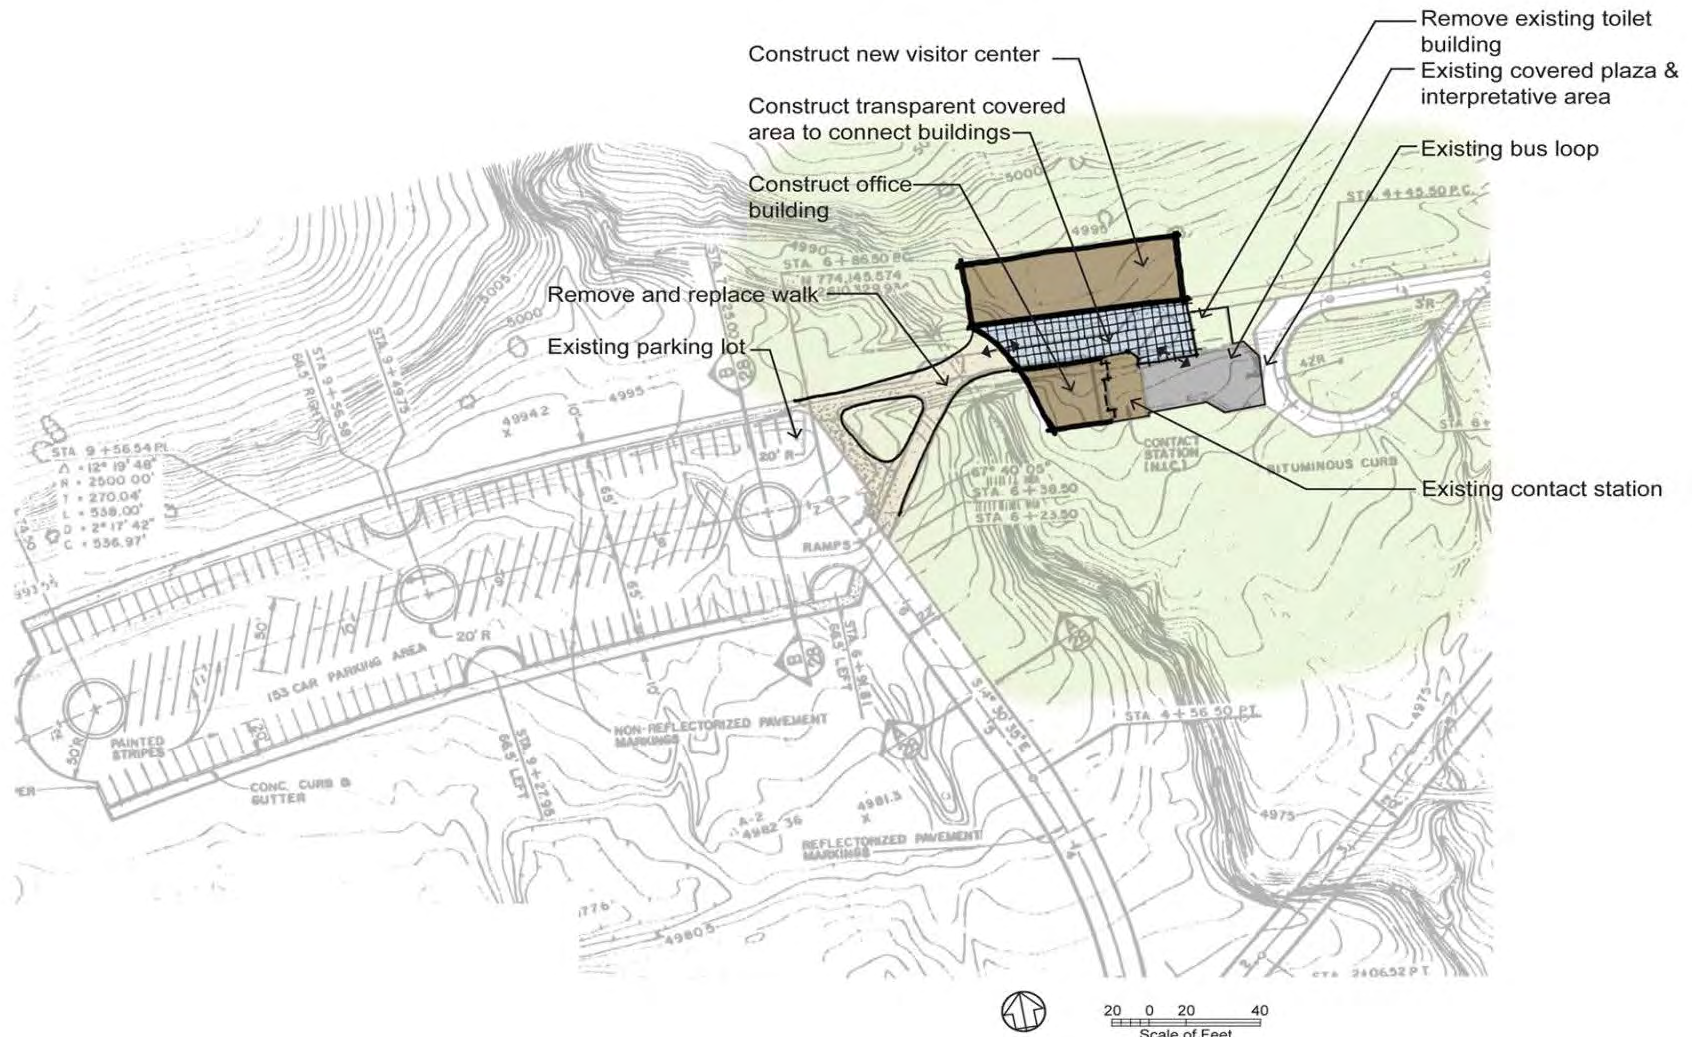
ALTERNATIVE B NEW VISITOR CENTER SITE LAYOUT CONCEPT
